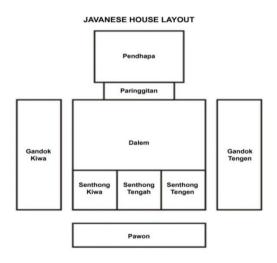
Javanese House Layout (Source: Ade Fajarwati, 2016)
